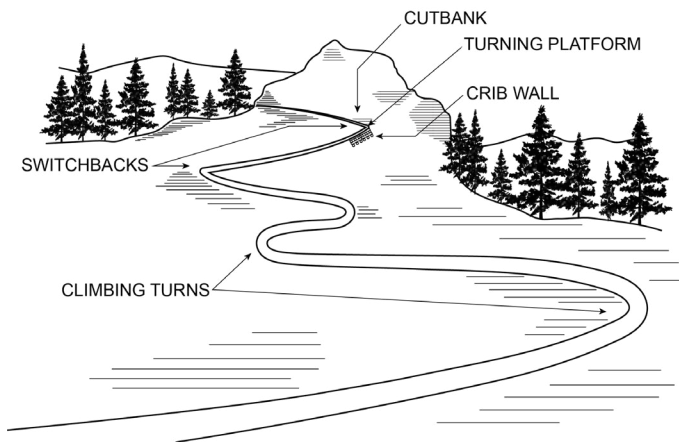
Climbing turns should be built on moderate slopes (less than 25 percent), whereas switchbacks can be constructed on steeper grades. Switchbacks require more technical construction techniques, such as installing crib walls.
